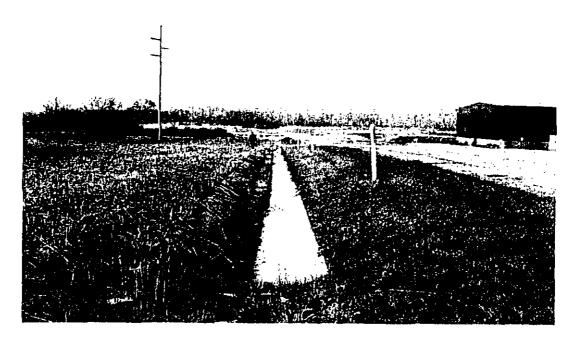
View of Proposed Route along Bohkle Boulevard, facing northwest.
